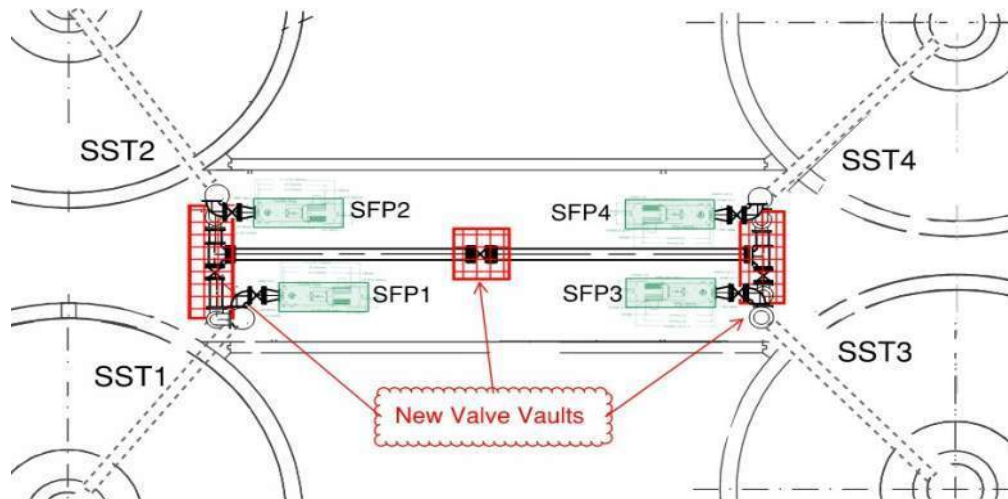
Alt-2A SSTs 1-4 Pipe Gallery Proposed Layout – Plan View
